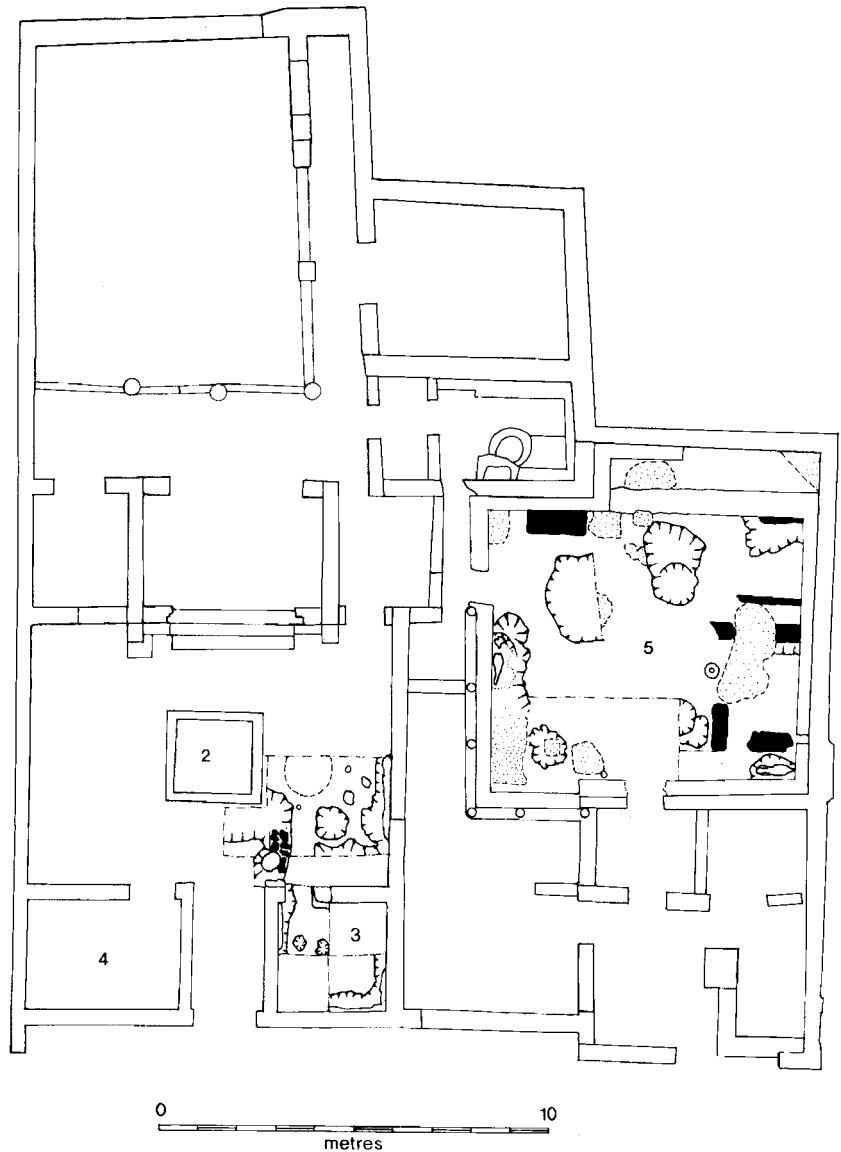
Plan of pre-house walls and features in houses 11 and 12.
